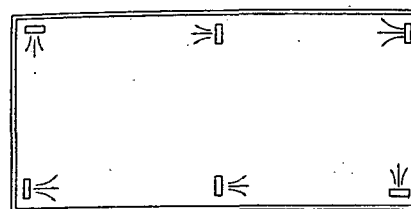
INSTALLATION ARRANGEMENT OF MULTIPLE SUSPENDED UNIT HEATERS
